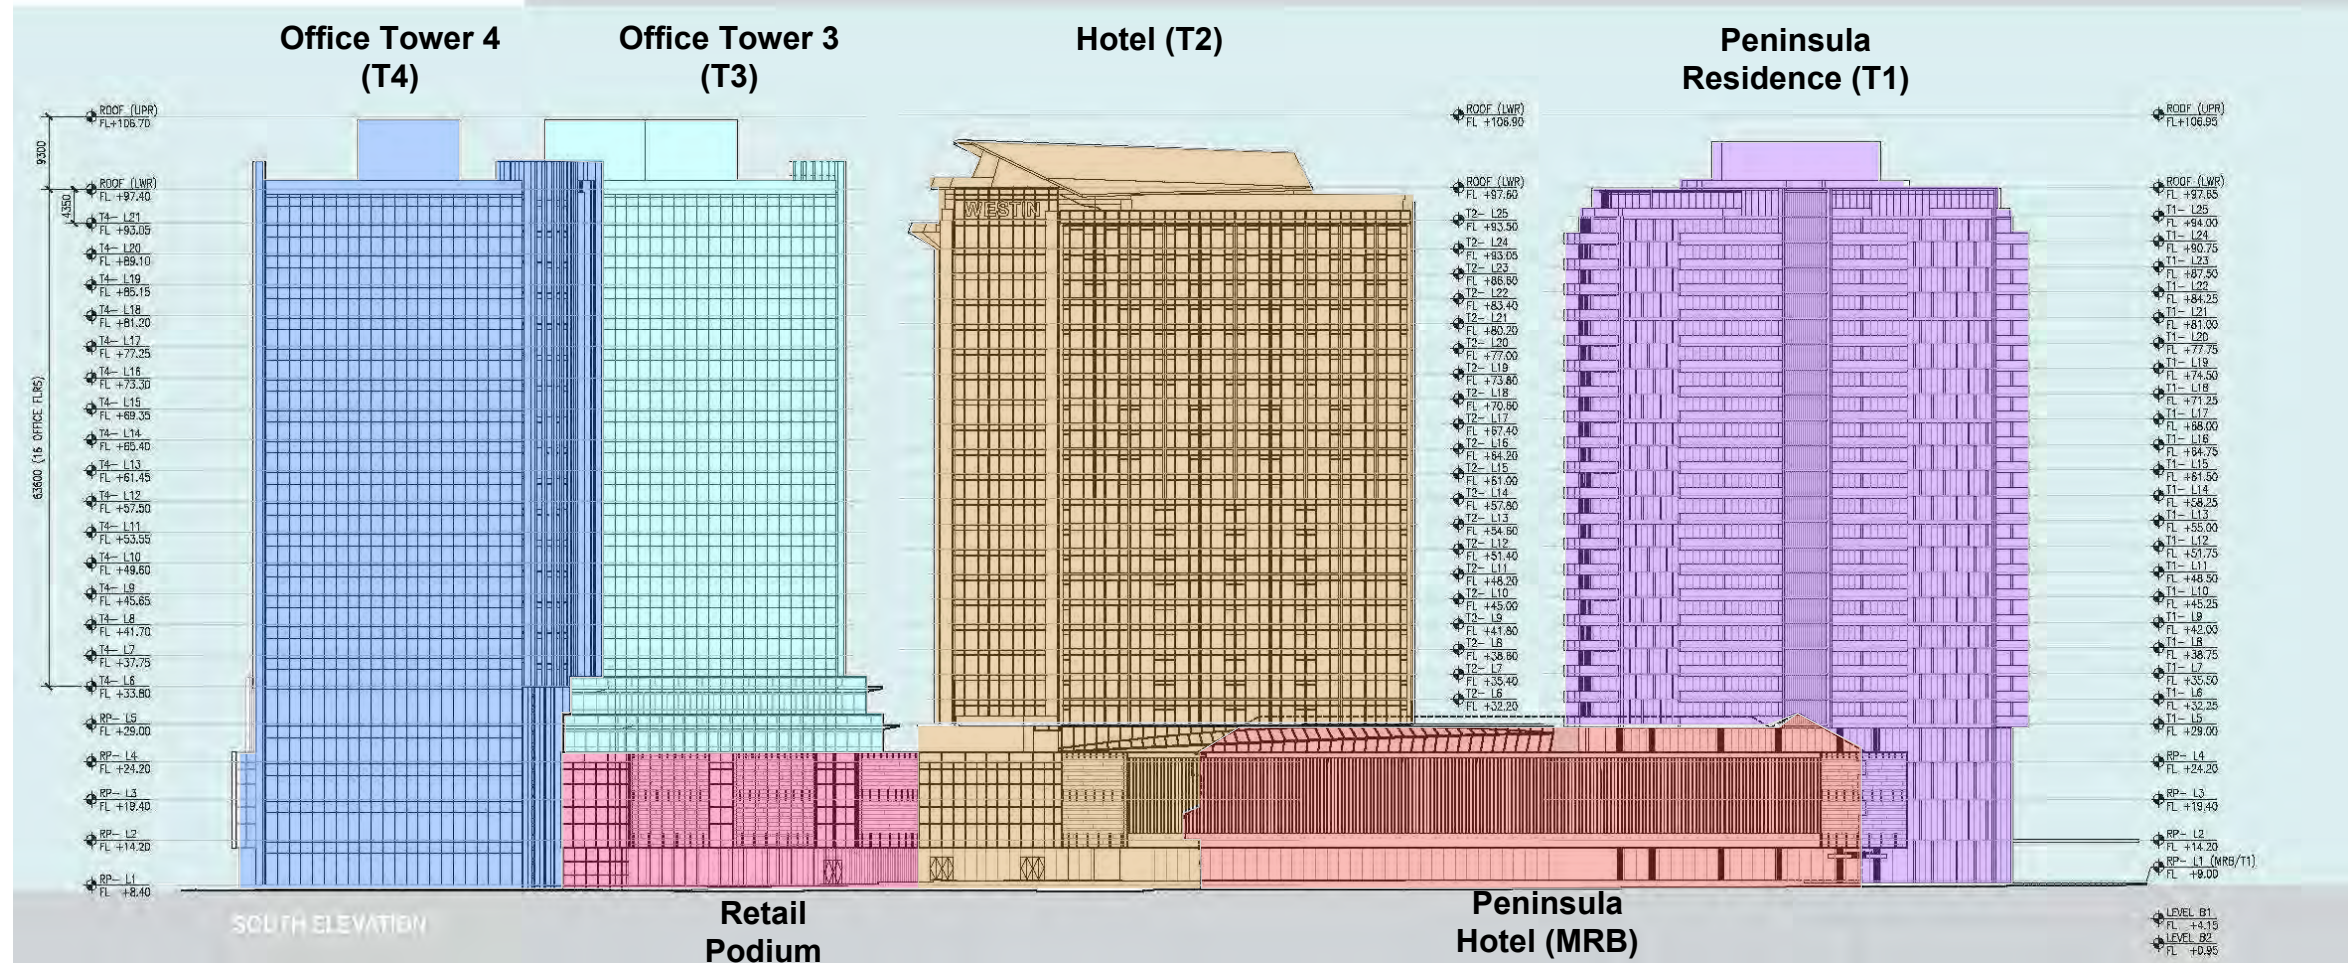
Sectional Elevation View of Proposed Project (East and South)
